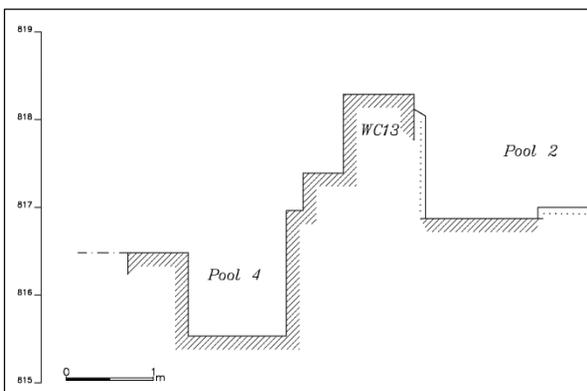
Section plan of Pool 2 and smoothed bedrock, looking north (plan by Shatil Emmanuilov).
